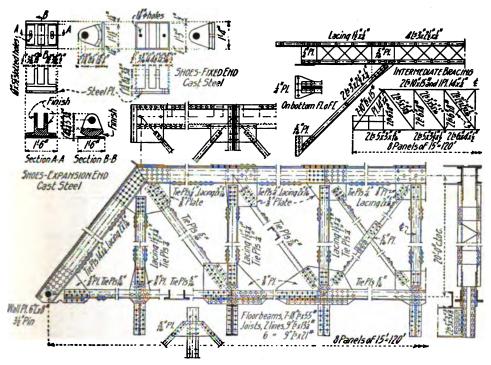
Detail Plans of Through Truss Span. Wisconsin Highway Commission.
